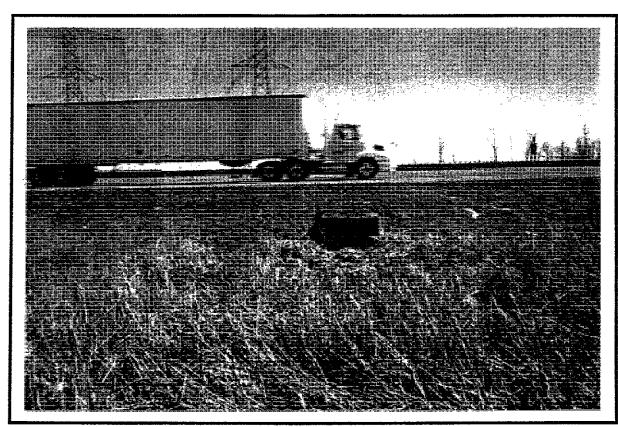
Looking at the upstream face of the culvert from the North side of Highway 401.
